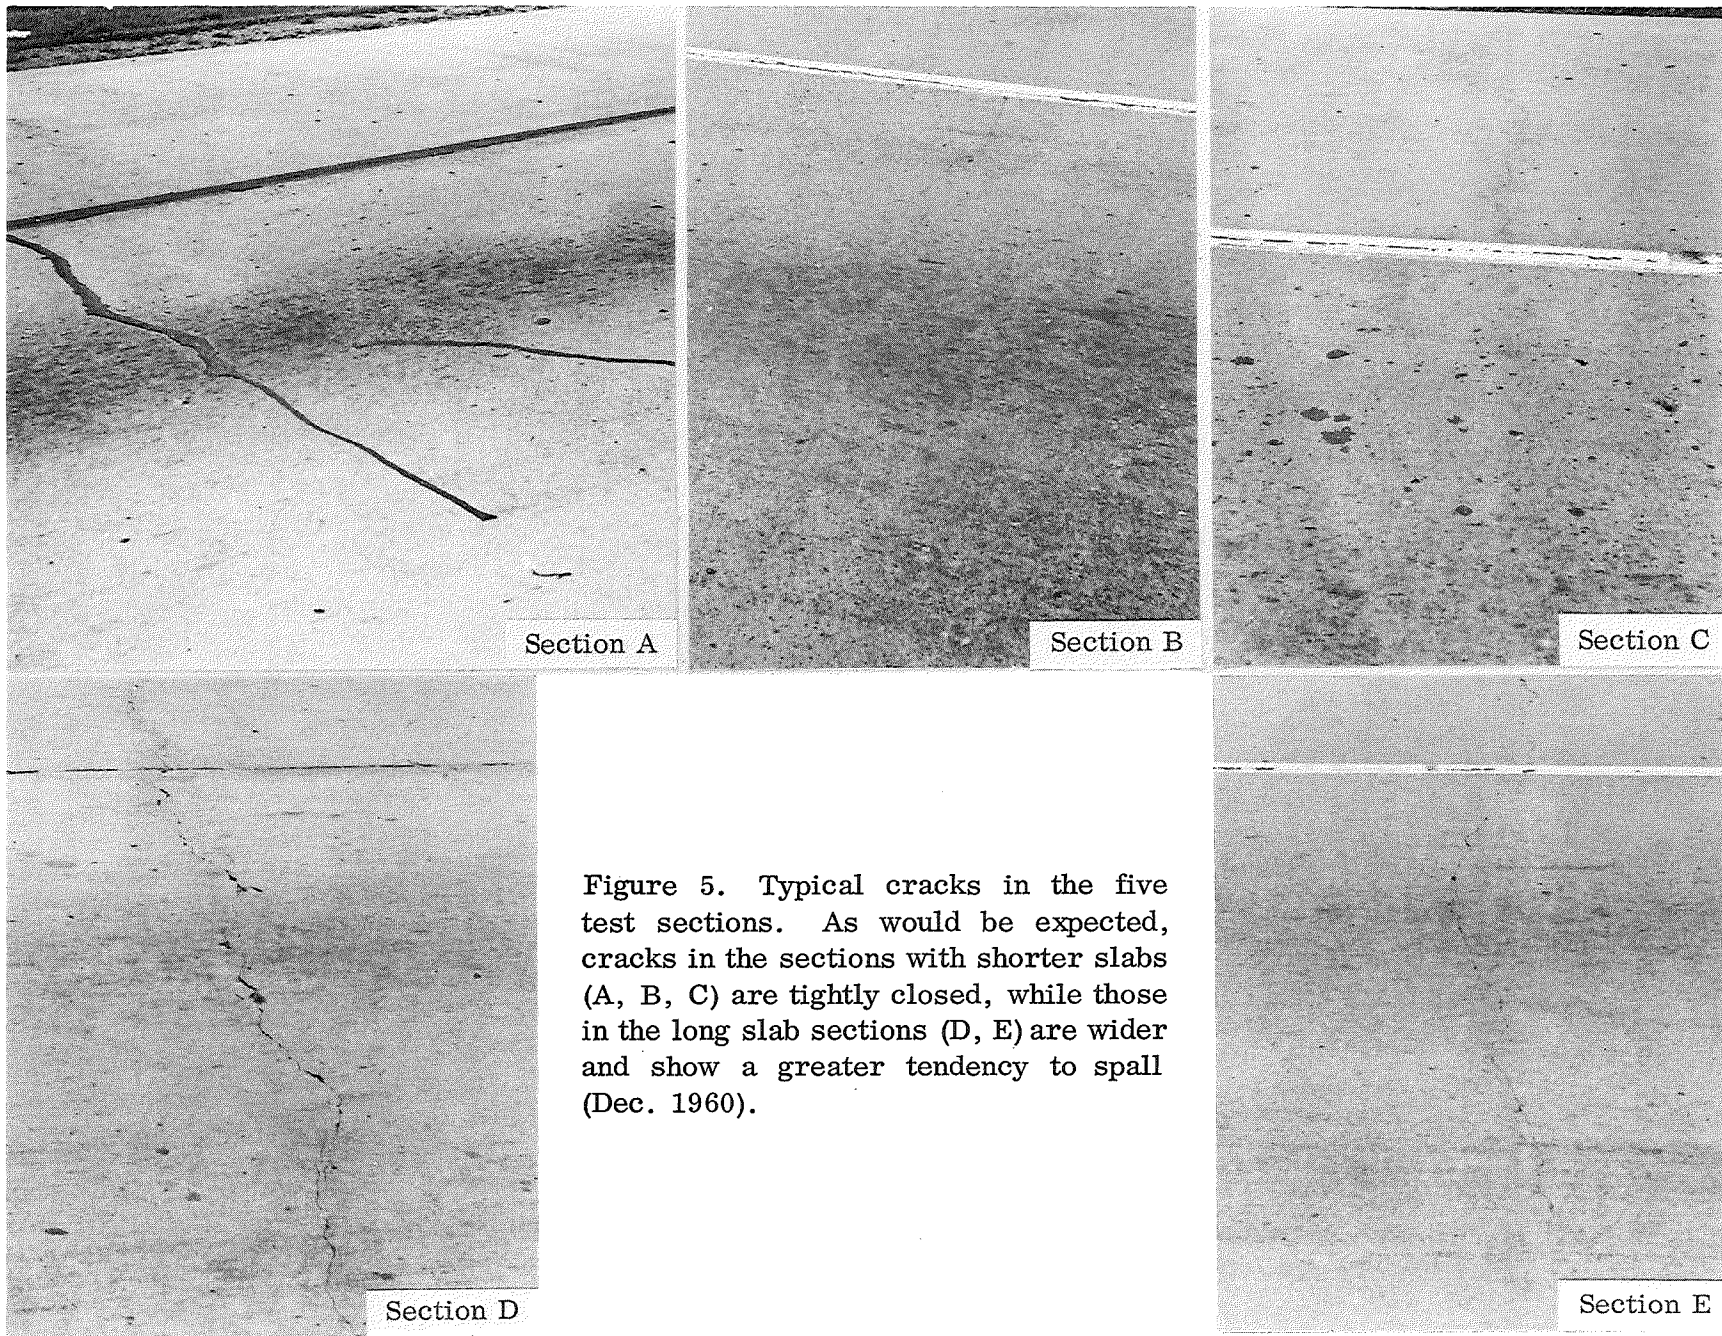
Typical cracks in the five test sections. As would be expected, cracks in the sections with shorter slabs (A, B, C) are tightly closed, while those in the long slab sections (D, E) are wider and show a greater tendency to spall (Dec. 1960).
